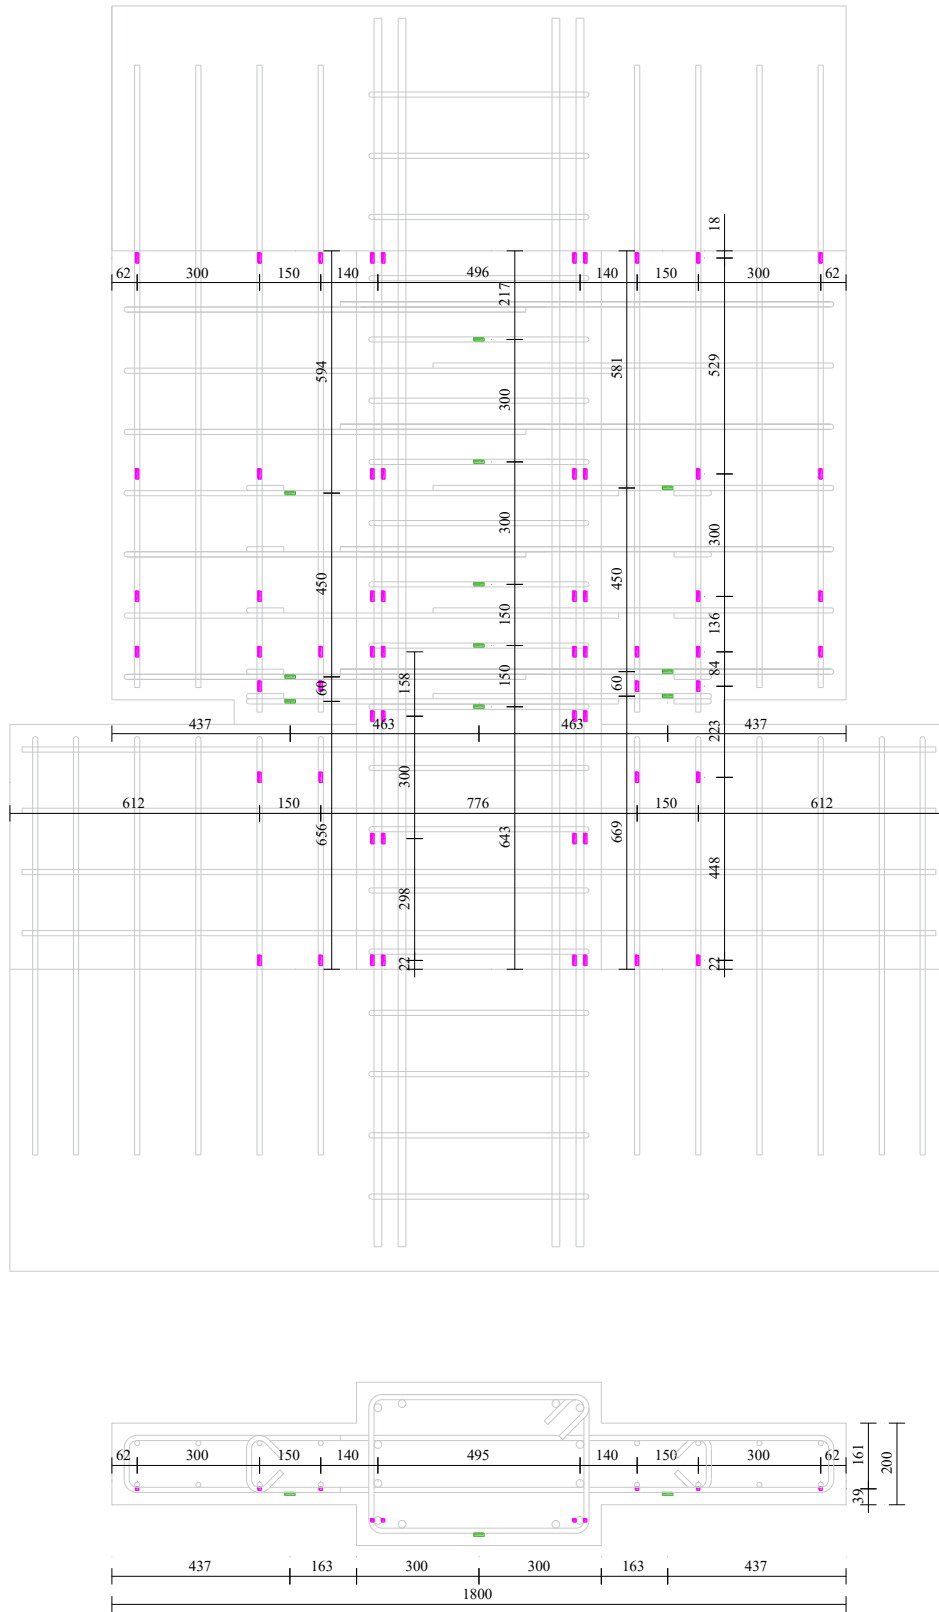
Location of the strain gauges on the reinforcement of specimen BS
